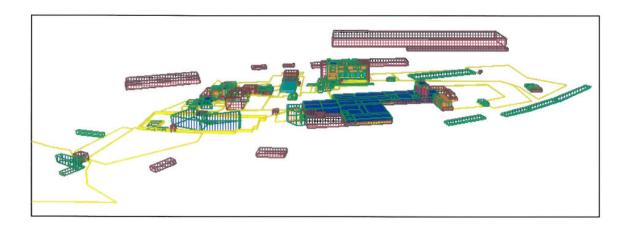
3-D View of Buildings and Zones of Congestion and Confinement
